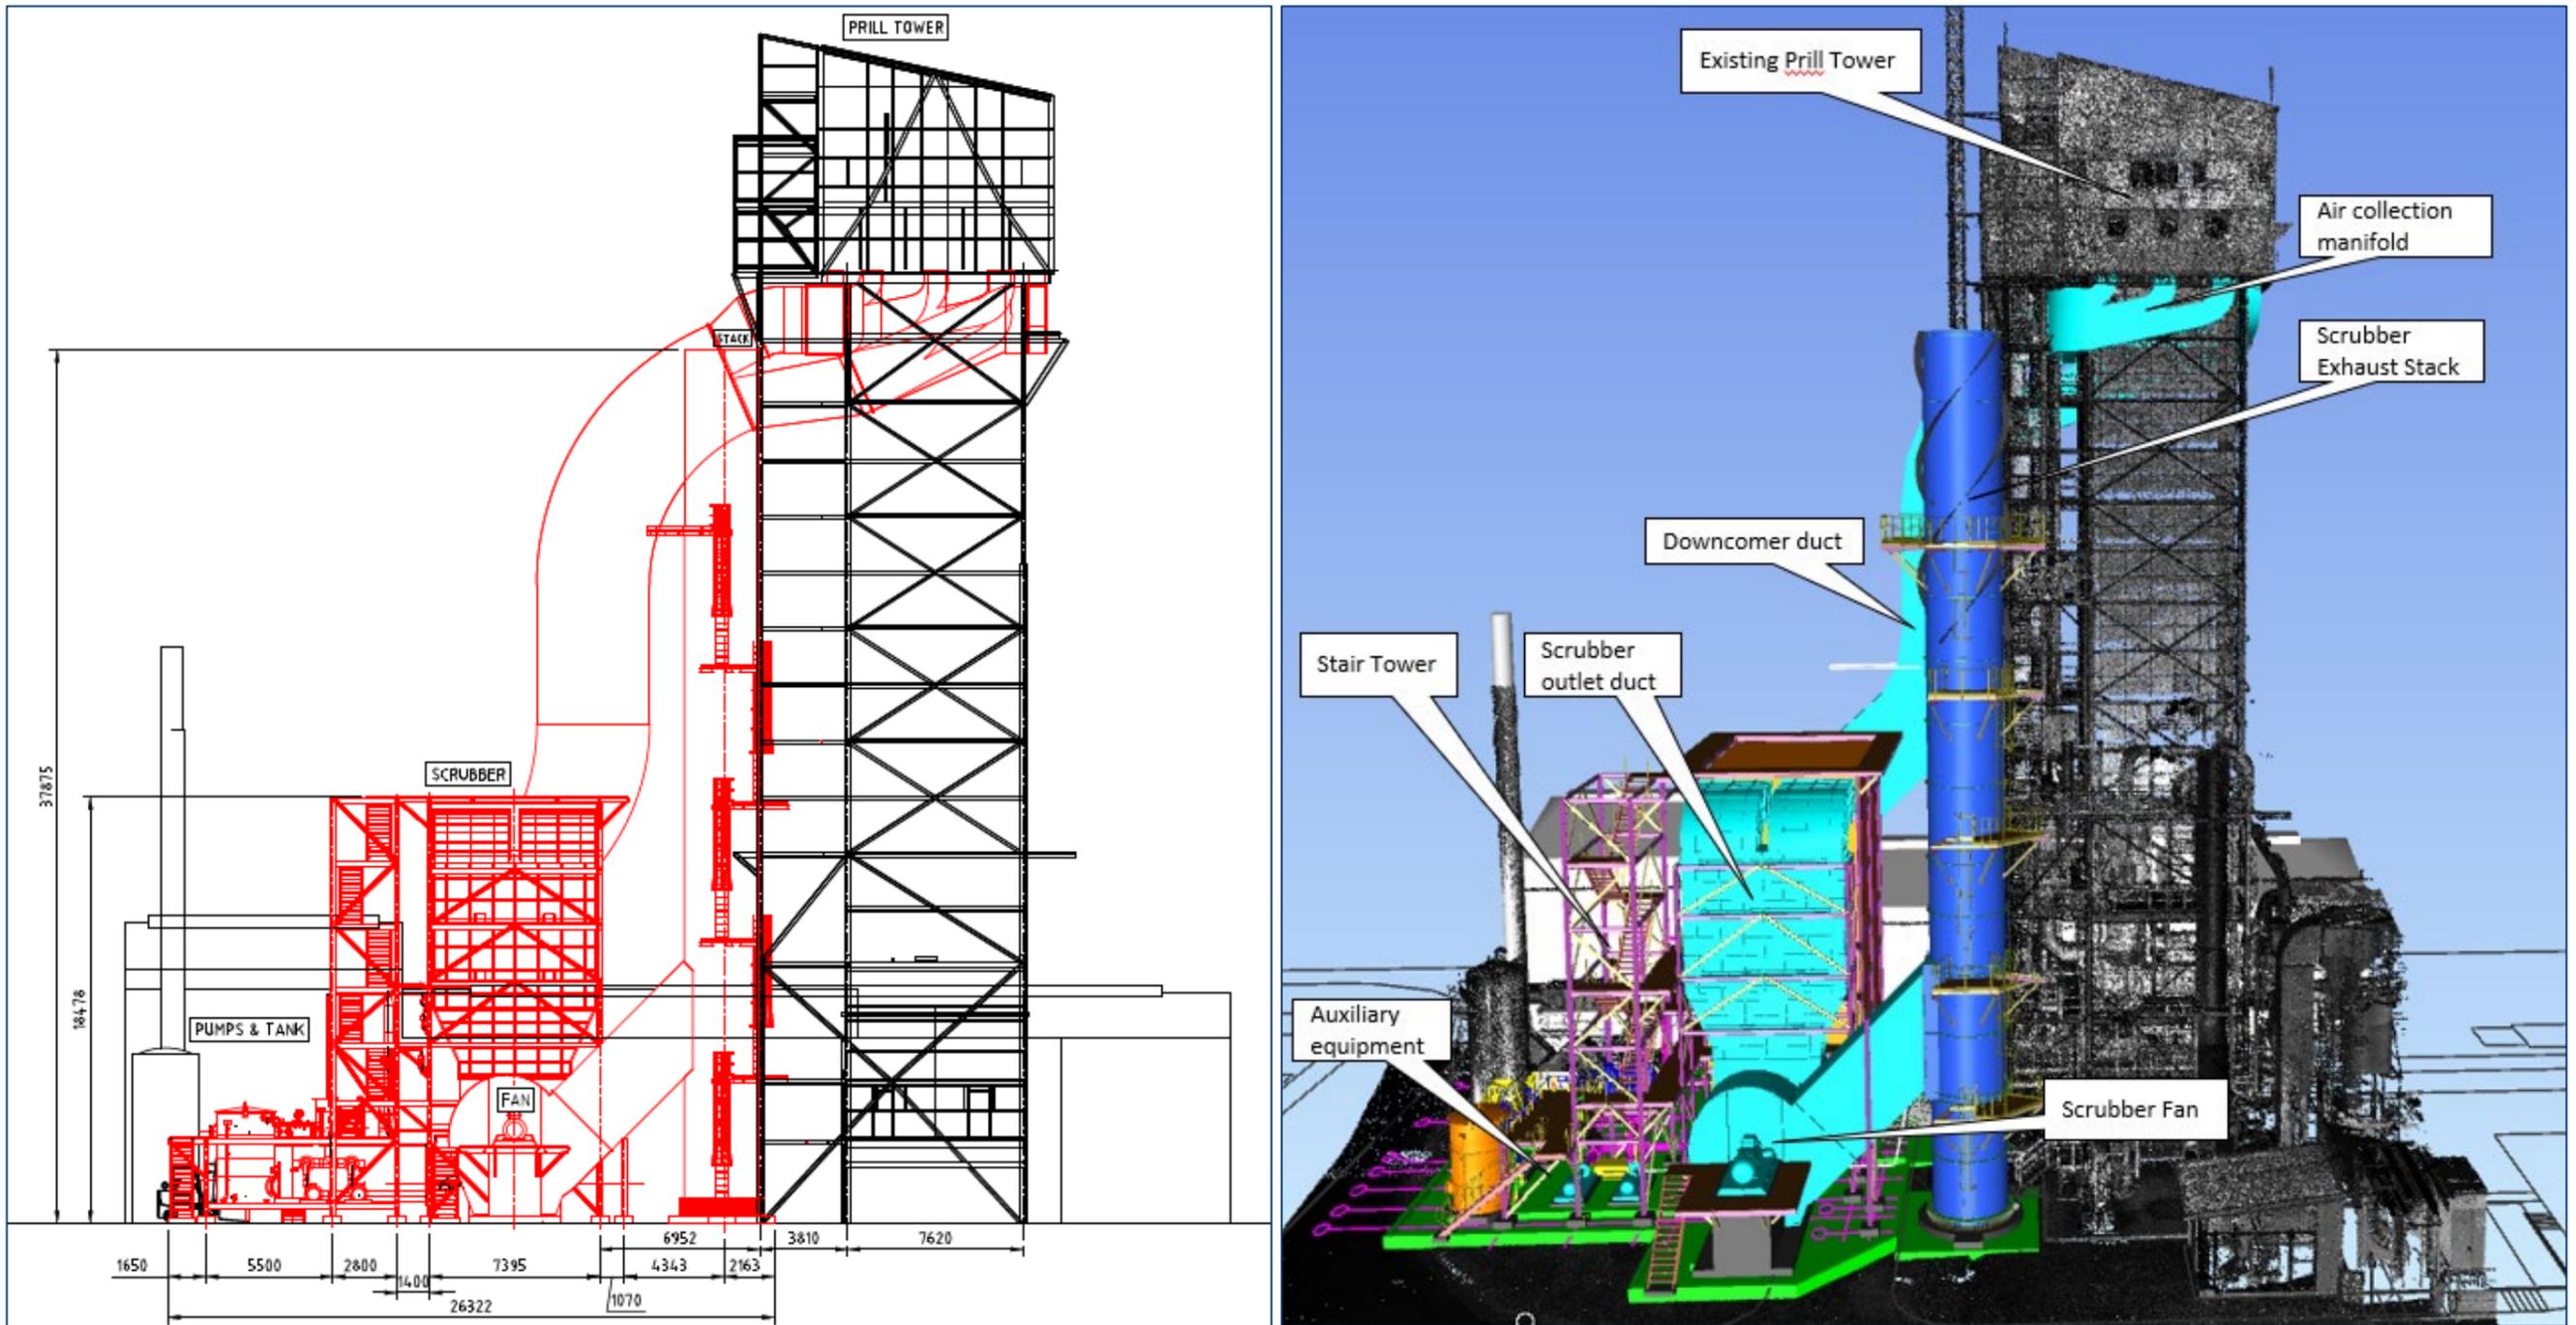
East Elevation - Prill Tower Scrubber – 2D drawing (extract from Appendix D) and 3D model views (all dimensions in mm)
